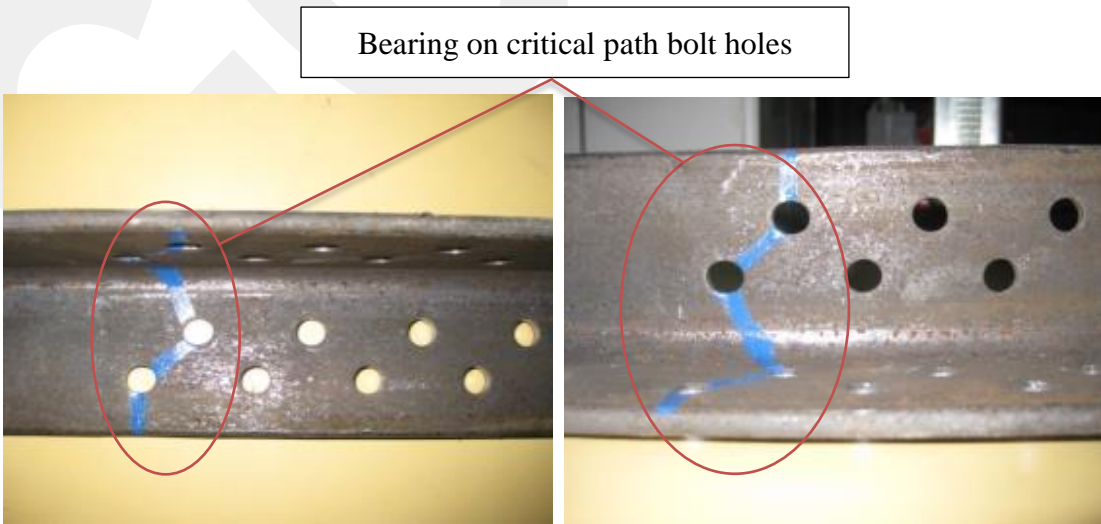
Critical path and bearing on bolt holes (Specimen-1)
